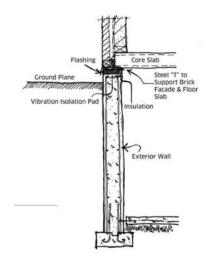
Examples of Vibration Isolation for Low-Rise Buildings (per RAC)
